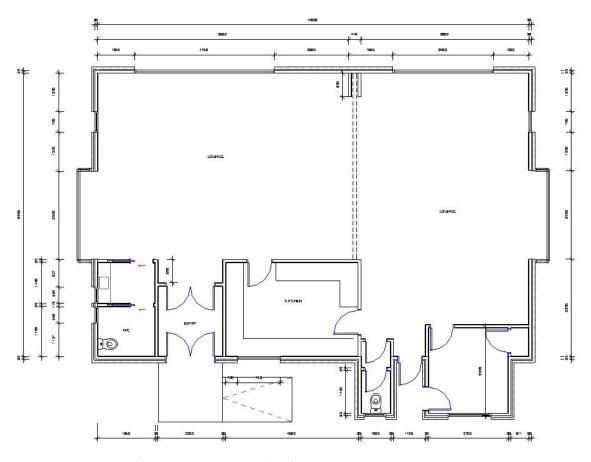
Floor plan of Residents Lounge at Jecks Place.
